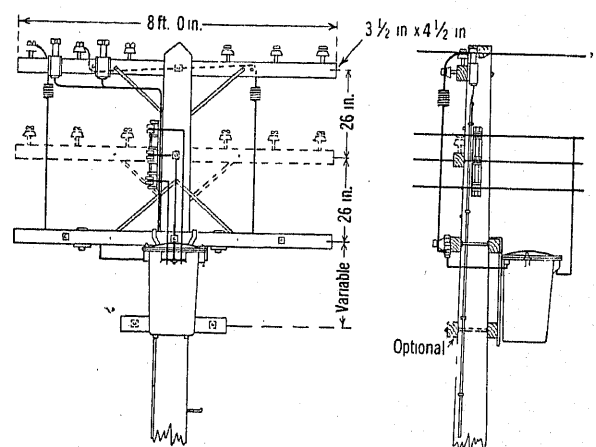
STANDARD TRANSFORMER MOUNTING OF ONE 5-15 KV-A. UNIT
